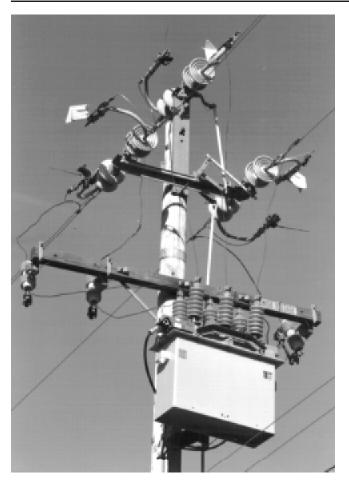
600 Amp KPF Air Switch Crossarm Mounted
